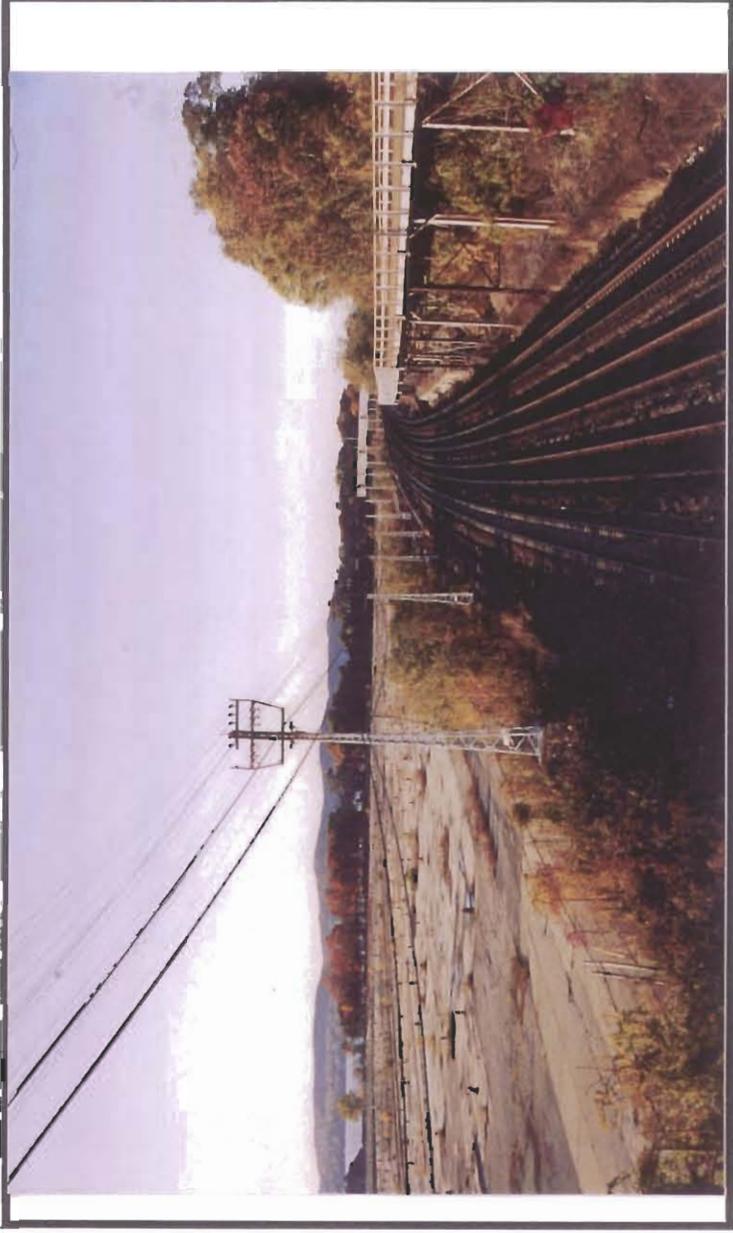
View of MetroNorth railroad tracks from Beekman Avenue. General Motor plant is located on area identified as the west parcel. Pedestrian bridge from east parcel parking lot is in background. Roadway to east parcel parking area is east of railroad tracks.
